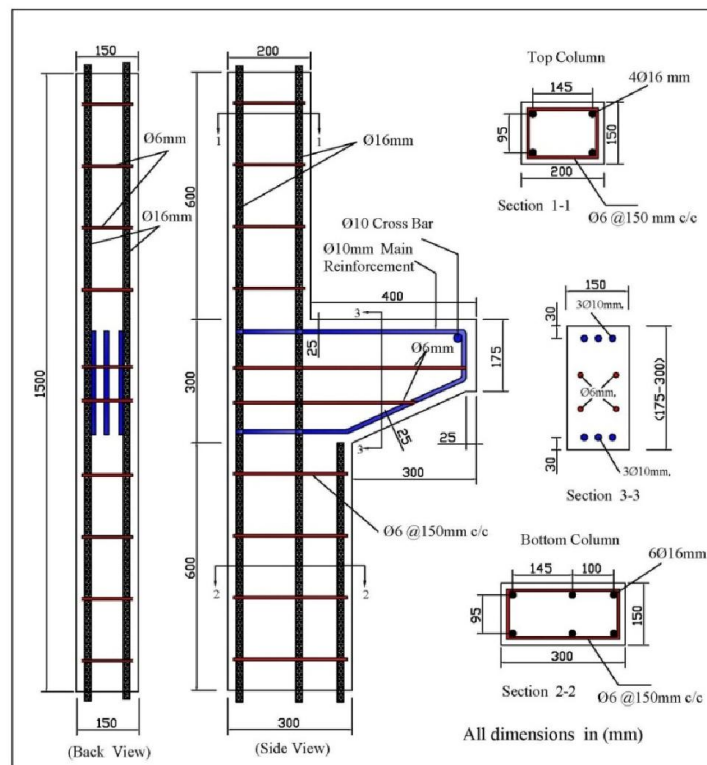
Reinforcement Details and Dimensions of Test Specimens
